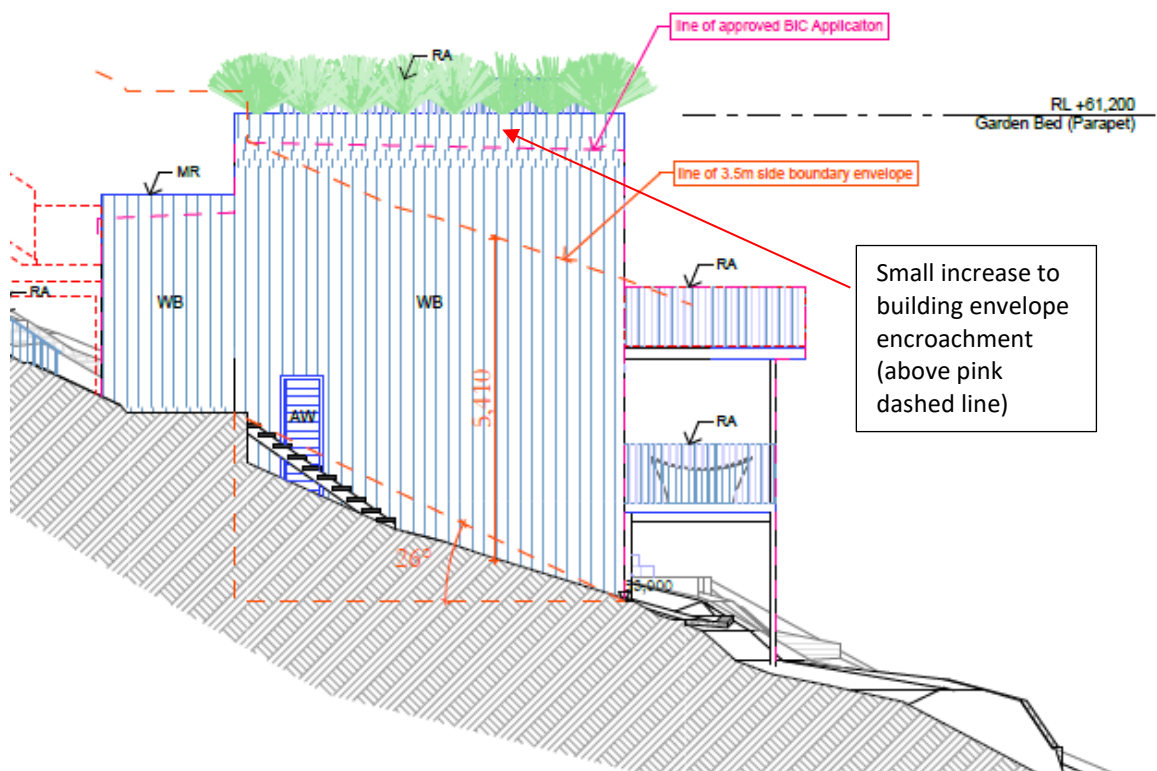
Extract from plans (East Elevation DA10) showing the building envelope encroachment
